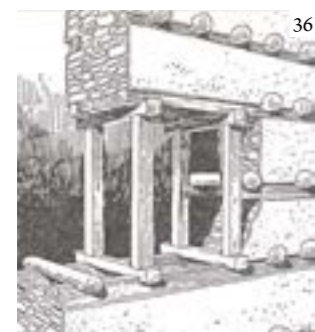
Adjacent building to the church, with wooden structure dissolving in the side wall
